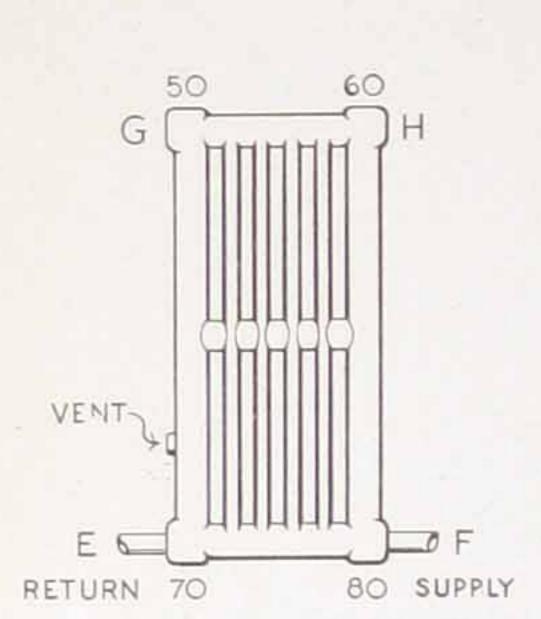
One and Two-Pipe Steam - Regular Vertical Assembly
